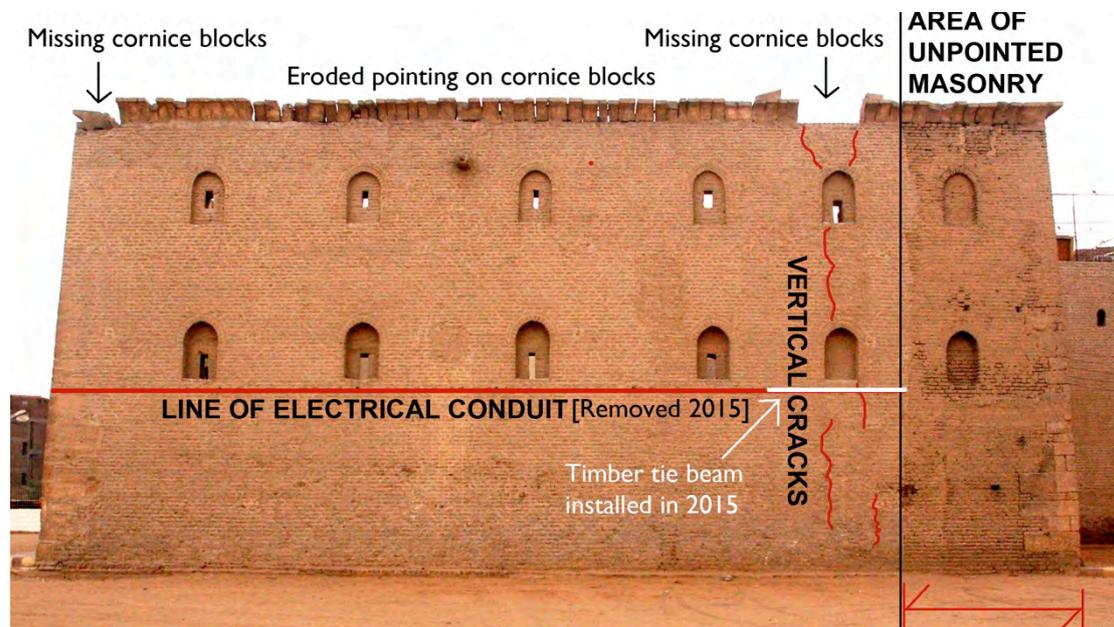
Diagnostic of west façade showing condition prior to intervention
